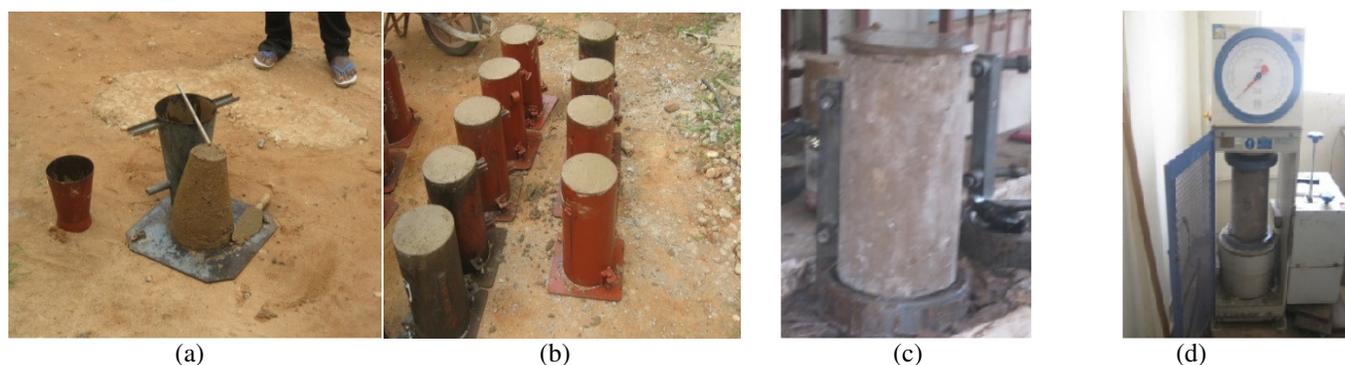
a) Abrams cone slump measurement test; b) Making cylindrical concrete specimens, c) Surfacing of cylindrical specimens; d) Simple compression test press.
